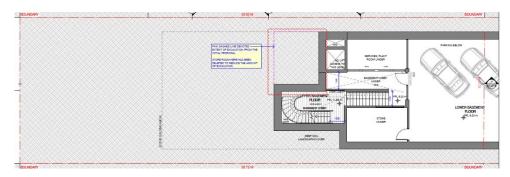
Proposed upper basement floor plan - 8 Victory Street, Clovelly (Source: BJB Architects Pty Ltd)
